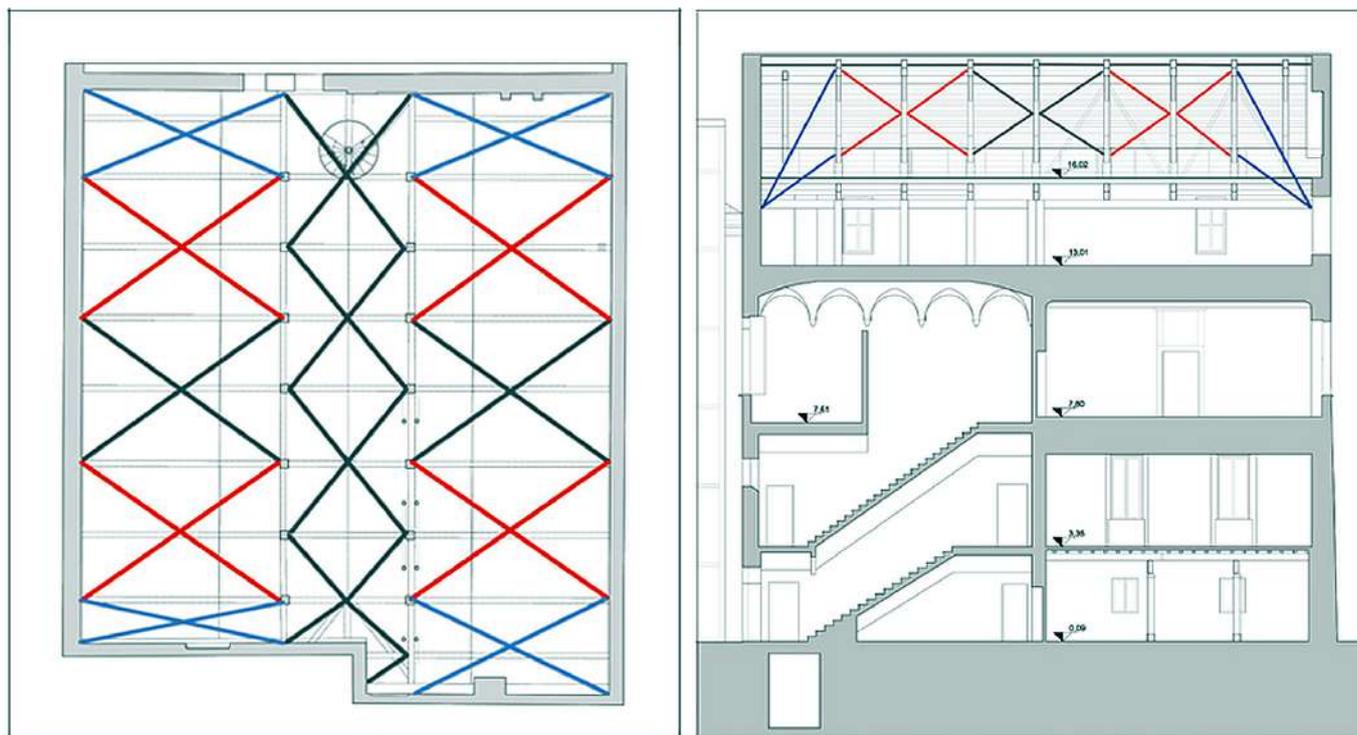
Improvement of the existing cross-bracing system of the southern timber roof: in grey are existing elements, in red is the new metal tube circular hollow section, while in blue are the new inclined metal bars.
